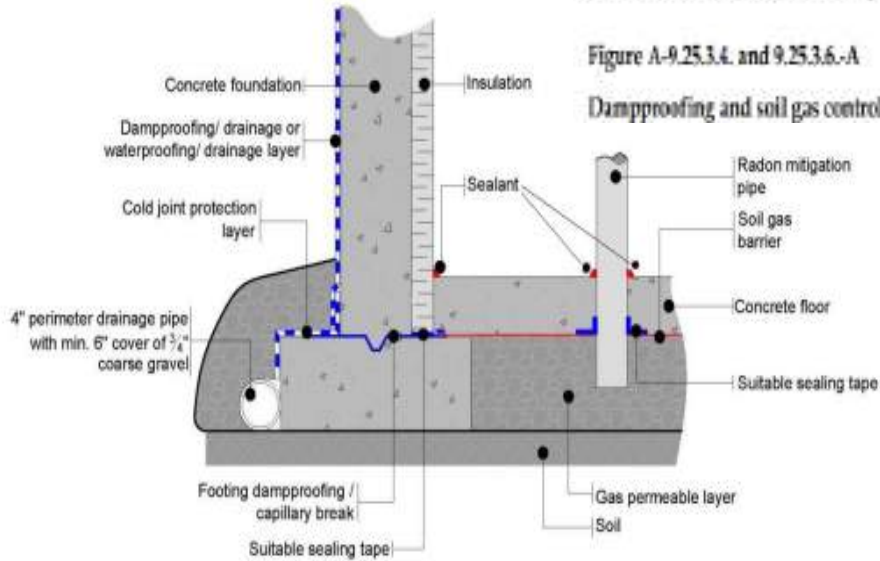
Sealing sub-slab membrane horizontally to concrete footing when insulation is between the foundation wall and floor slab
